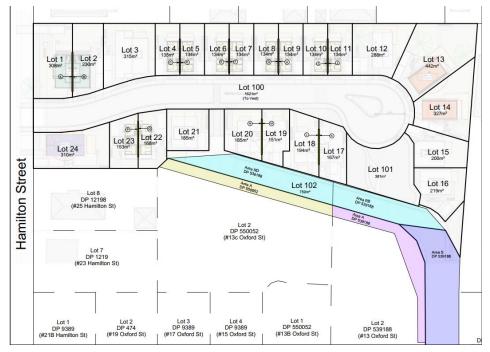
Proposed Scheme Plan for 29 Hamilton Street, Gore
